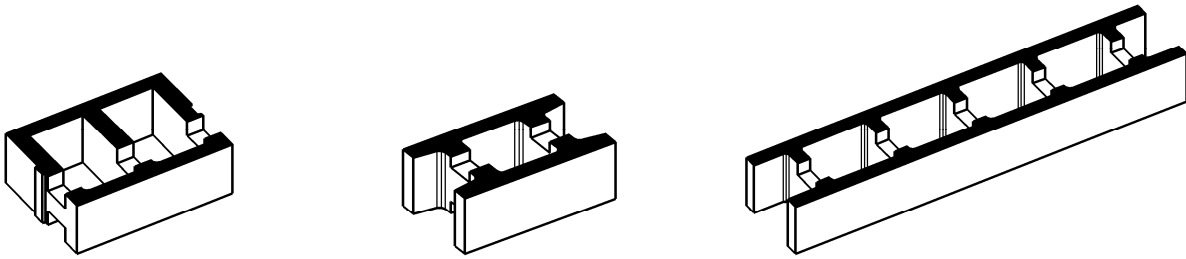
Examples of shuttering blocks without additional thermal insulation
